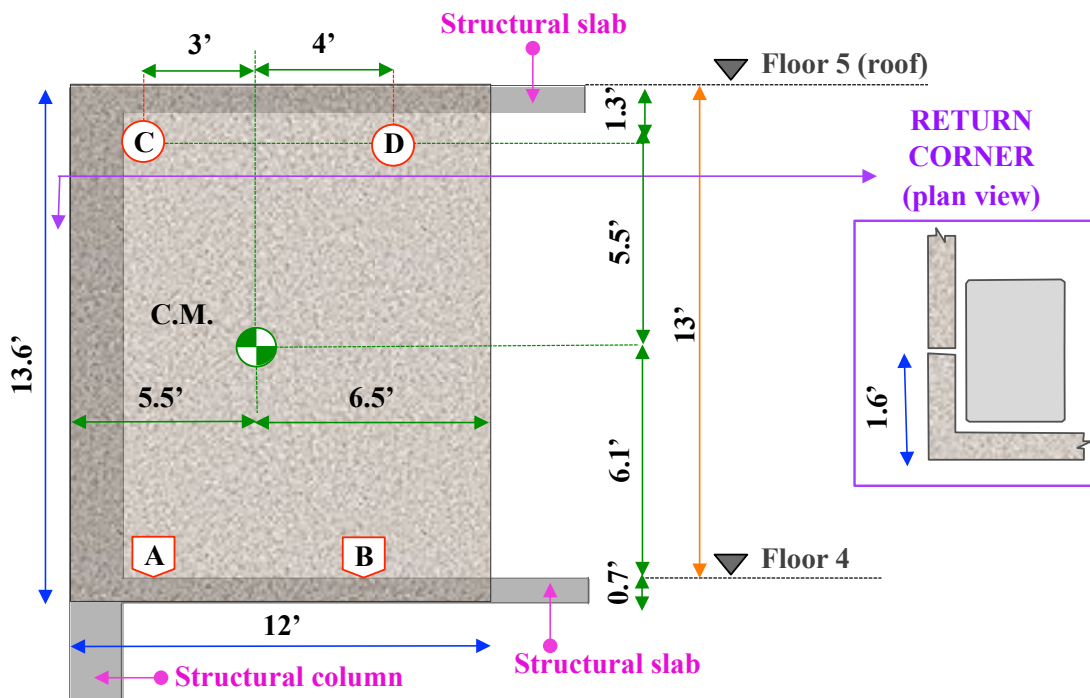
Detailed geometry of the APC panel under consideration (left: elevation; right; plan schematic). C.M. denotes center of mass.
